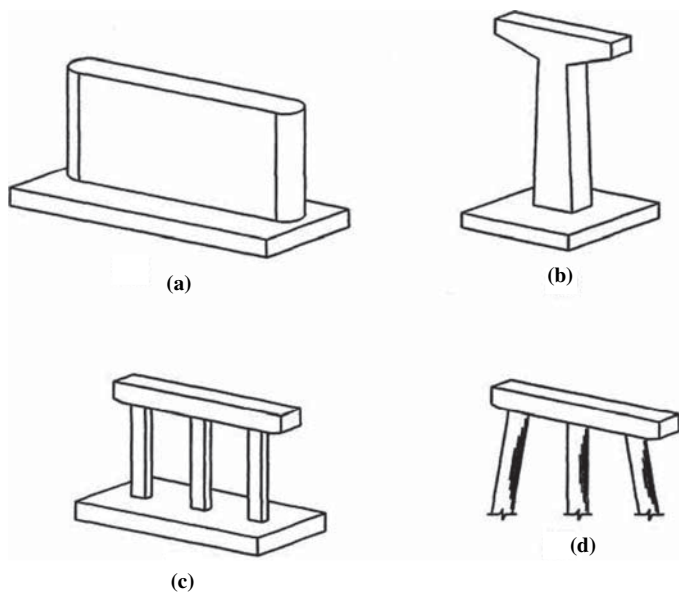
Typical column types: a) solid, b) single-column, c) multi-column, d) pile bent (NYSDOT, 2006).
